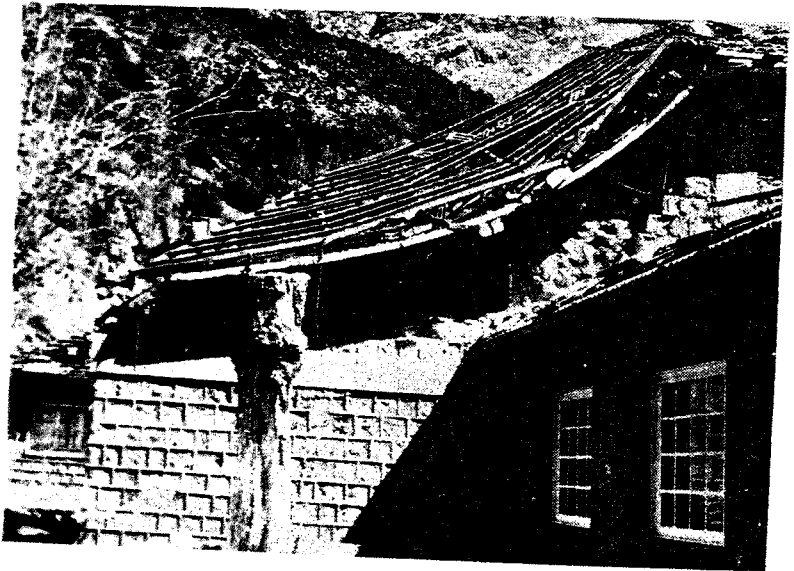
Melosas Summer School Camp. Collapsed staircases. It shows the concrete slab complete in spite of its large deformation.
